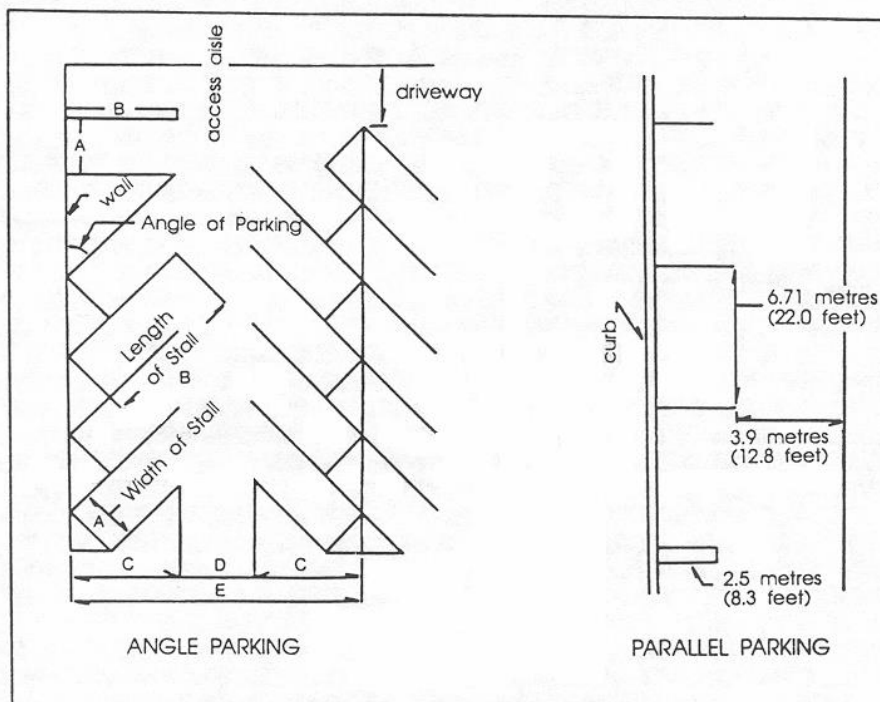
illustrates the parking space dimensions and requirements outlined in Subsections 4.1 and 4.3.
